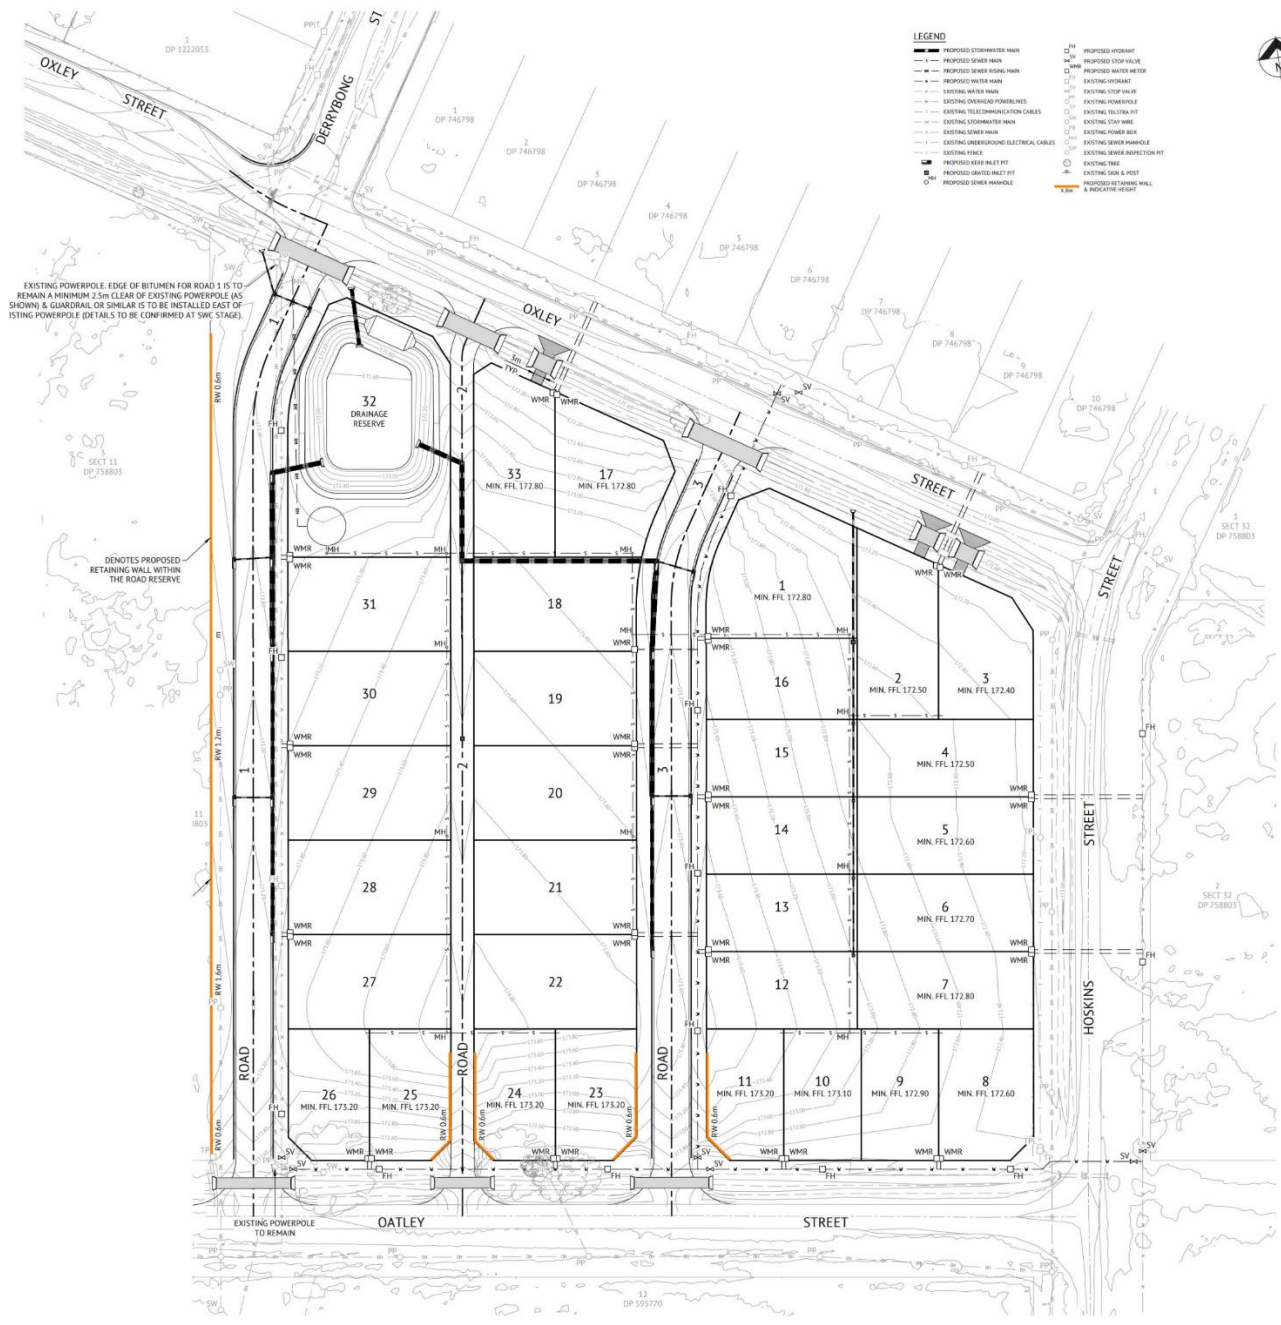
Concept plan extract showing proposed lot boundaries and access roads (Premise, 2023)
